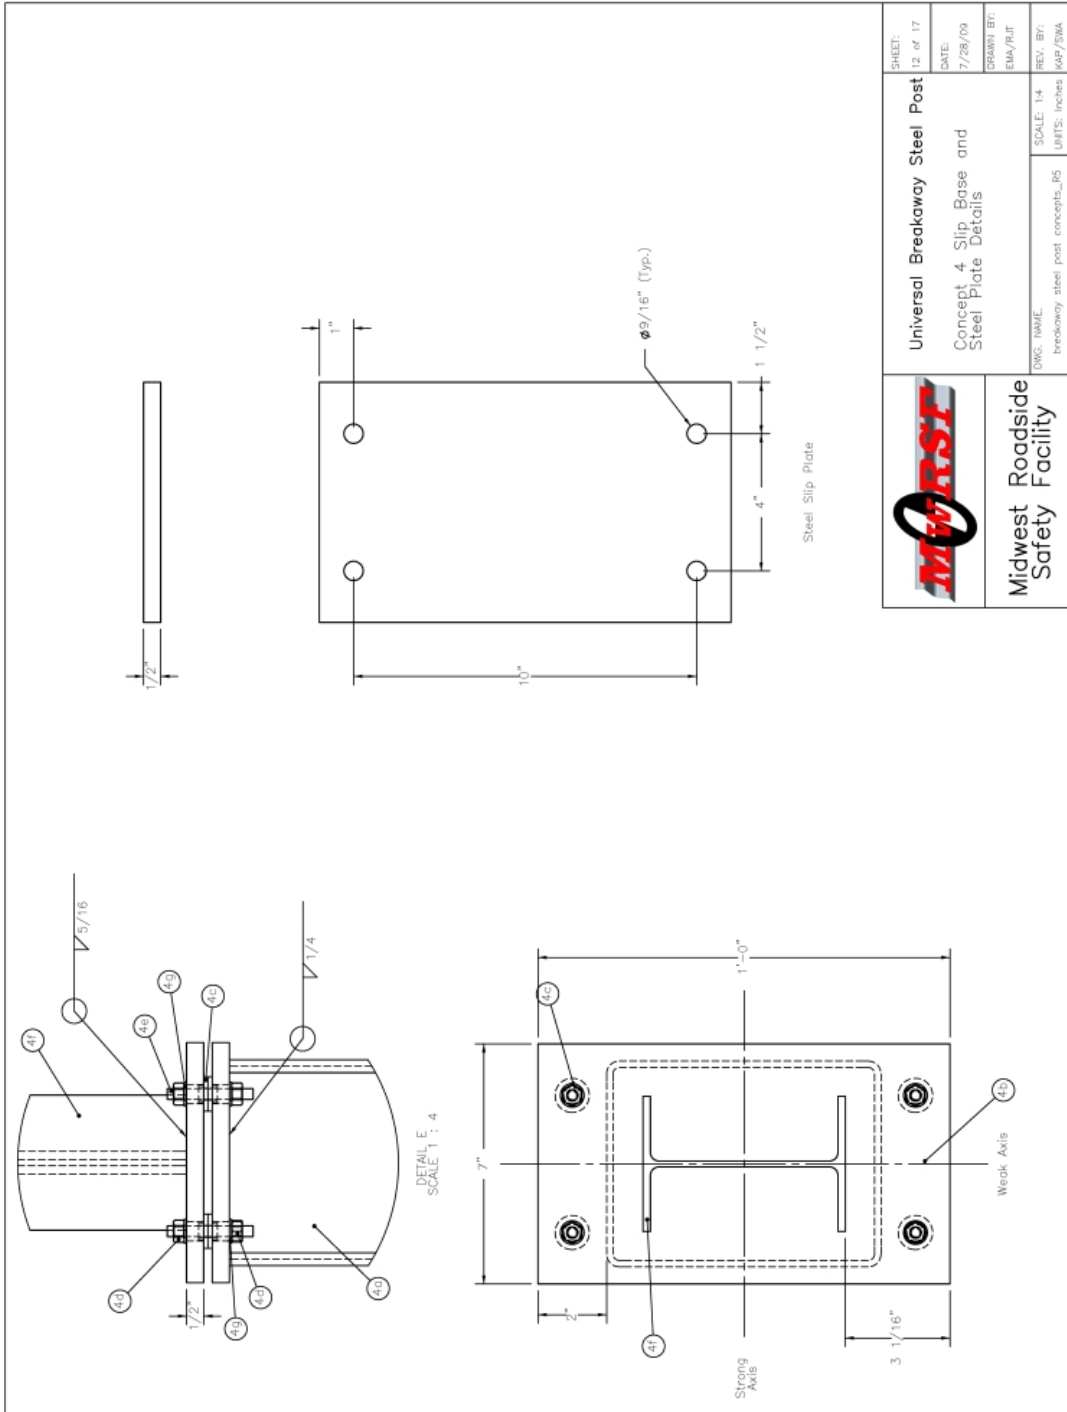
Fracturing Bolt (Slipbase) Steel Plate Details
